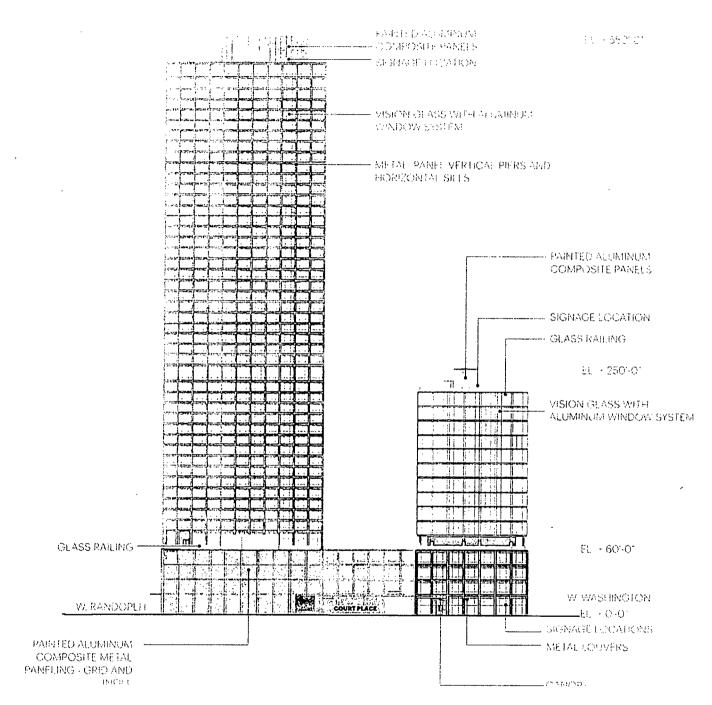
D: NORTH HALSTED STREET ELEVATION
